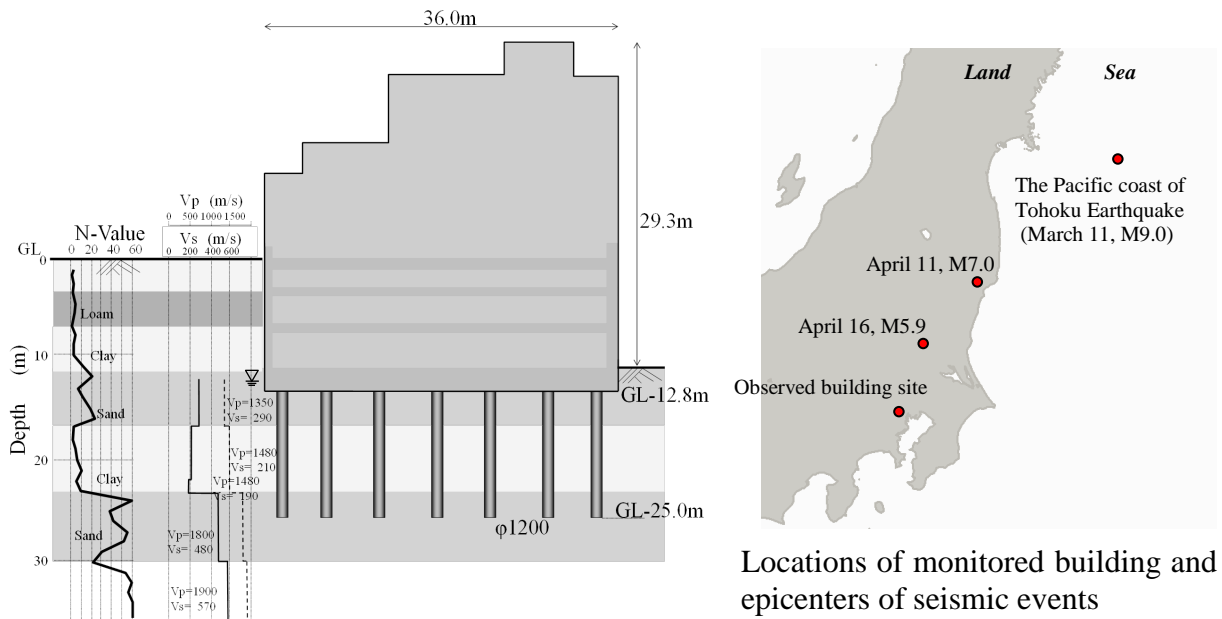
Schematic view of building and foundation with soil profile and locations of monitored building and seismic events
